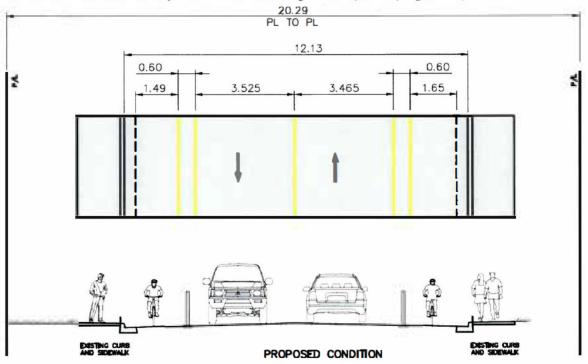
Approved Cross-Section Masefield Road to Fromme Road
